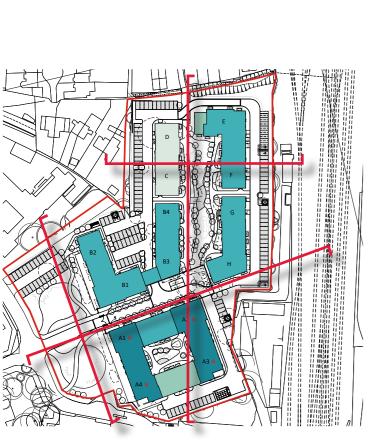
PROPOSED GROUND FLOOR SITE LAYOUT
